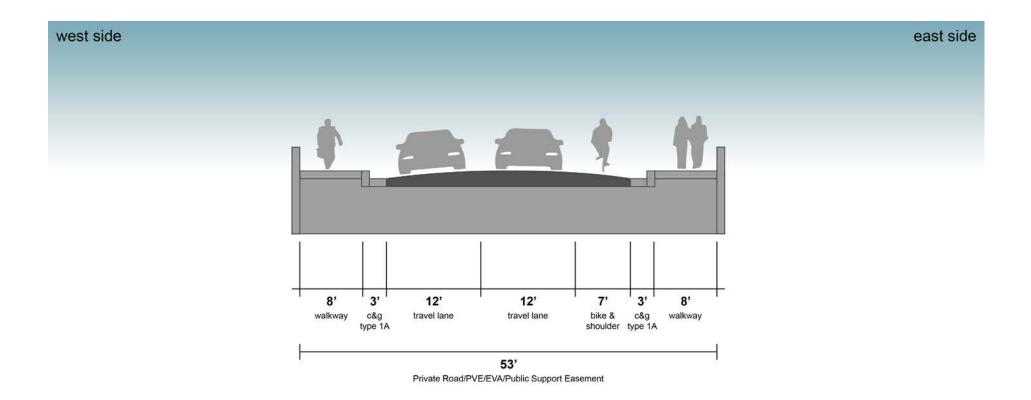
SECTION J: FAR EAST ROAD BRIDGE
